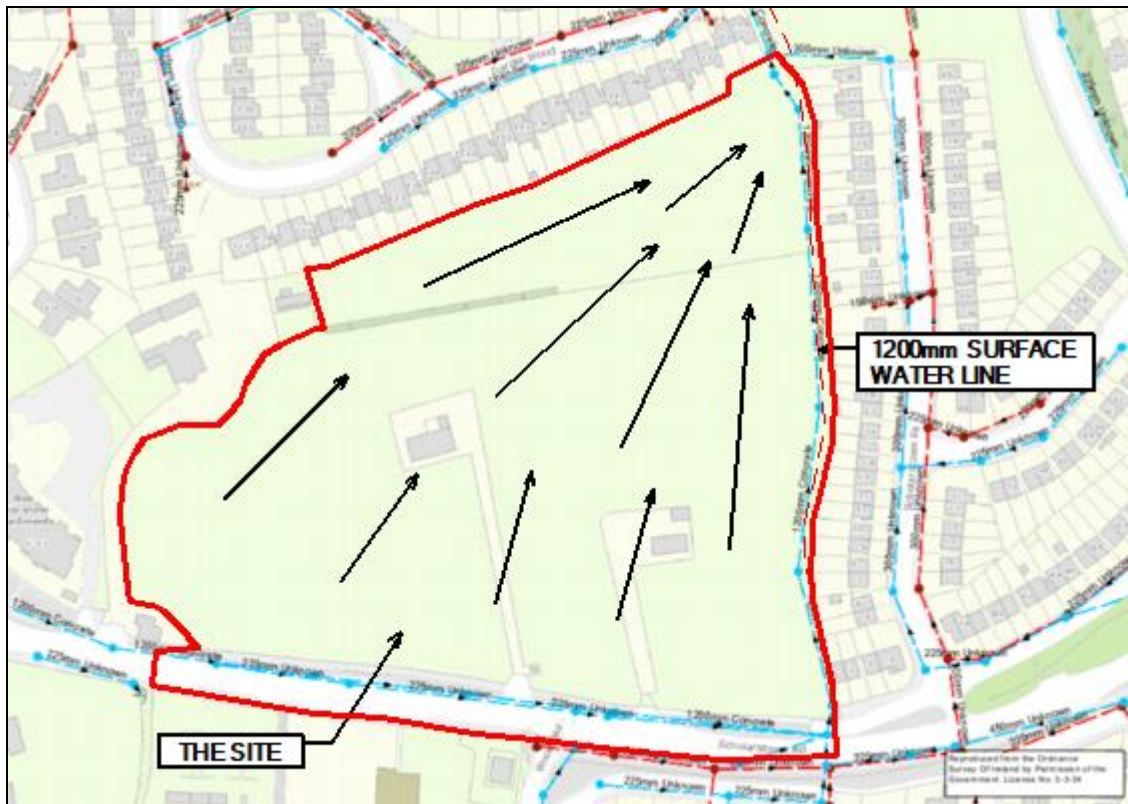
Extract from Irish Water Network Plan (Site Boundary Indicative Only)
